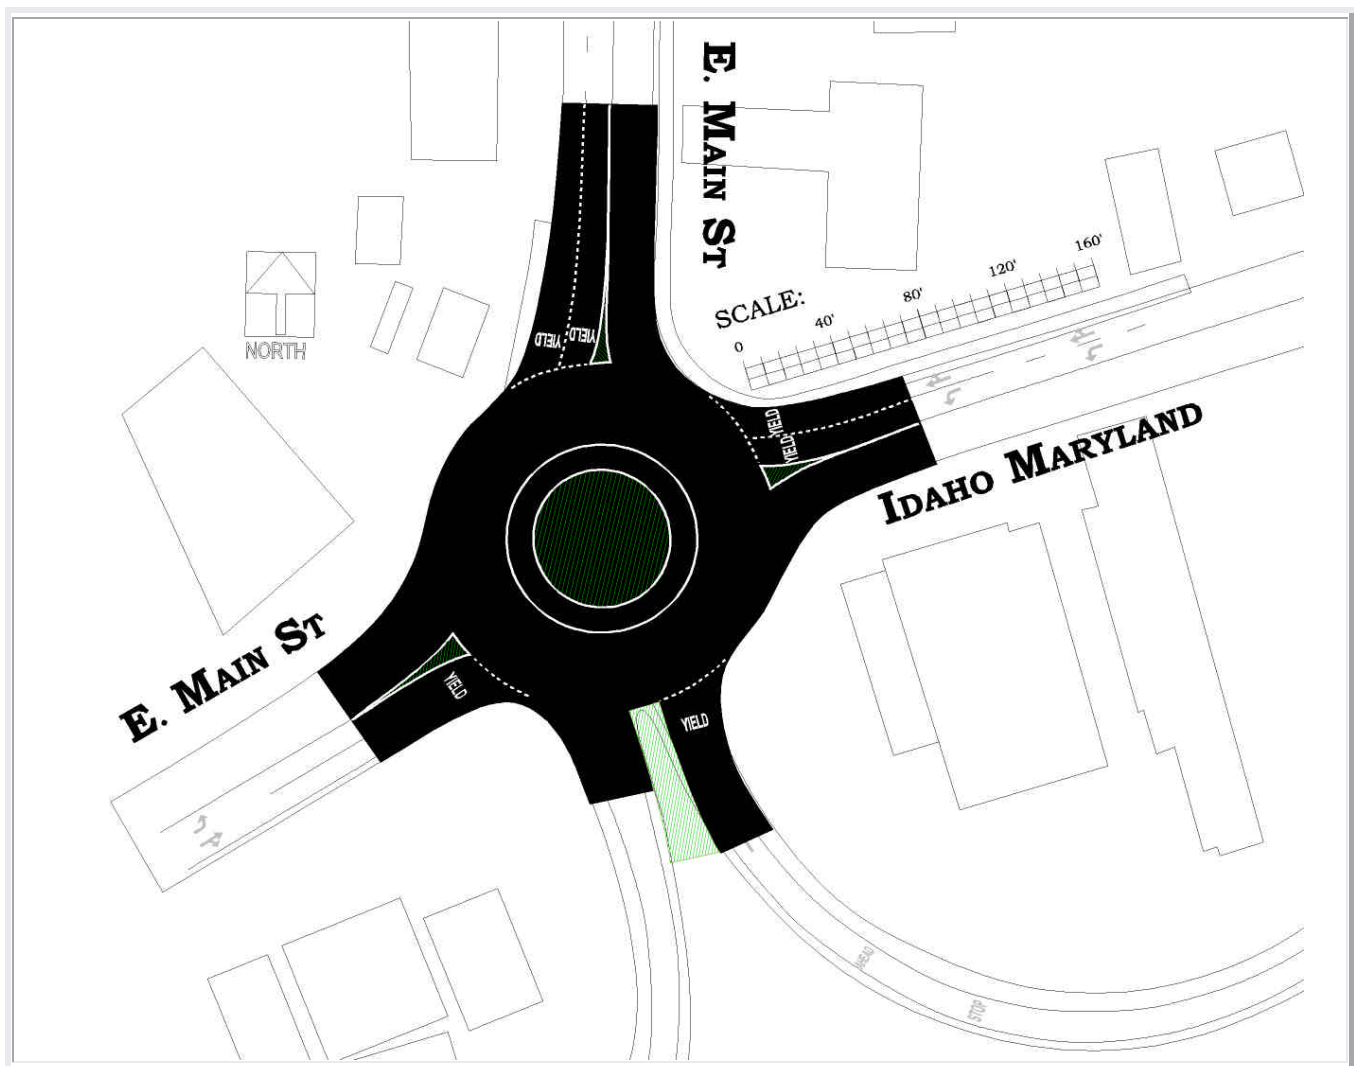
E. Main Street / Idaho Maryland Road Proposed Roundabout
